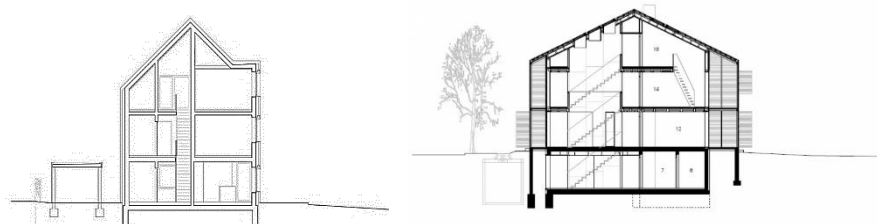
Haus Hesse - Wildrich Hien Architekten (<http://europaconcorsi.com/projects/219649-Haus-Hesse>); Fig. 285 - House K - Becker Architekten (<http://www.archdaily.com/354818/house-k-becker-architekten/>).
